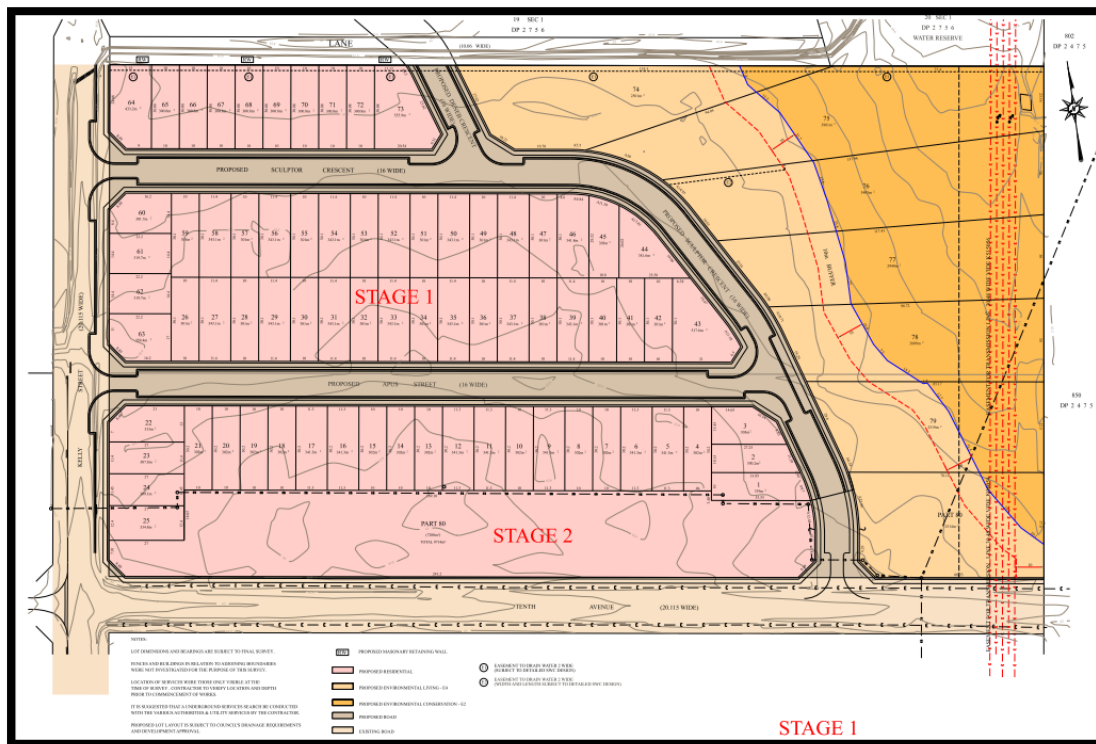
Stage 1 Subdivision Plan (Source: R. S. Canceri)
